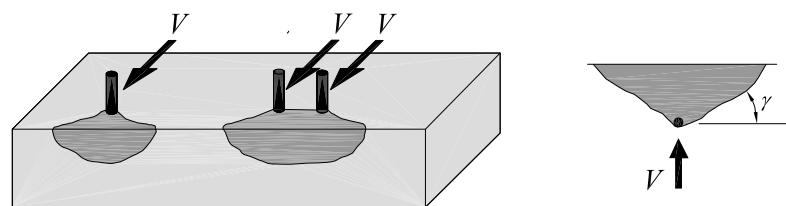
Concrete breakout cone due to reinforcing bars acting against concrete
